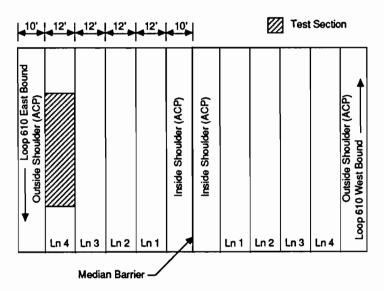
Typical plan view of a test section on IH 610 North experimental project, showing details of layout.
